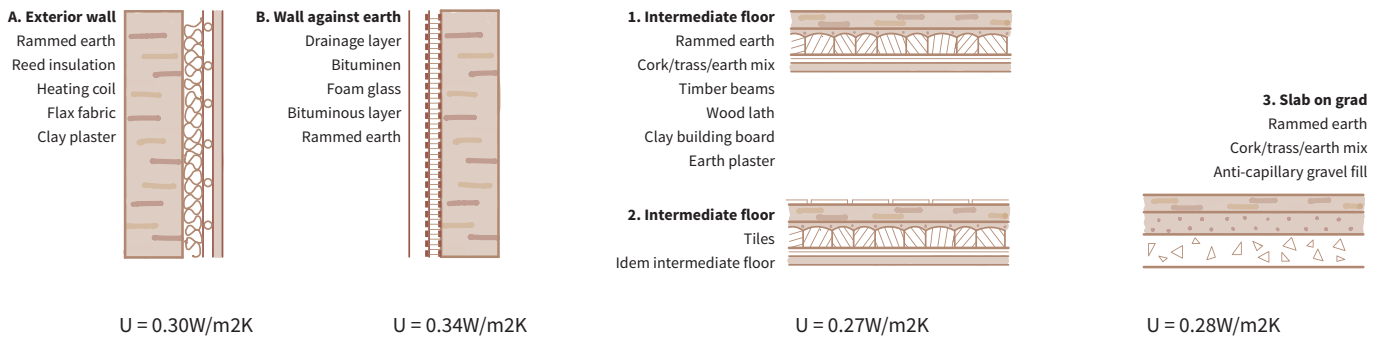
Rauch house walls and floors type (Adapted drawing from Boltshauser, R. et al. (2011))
